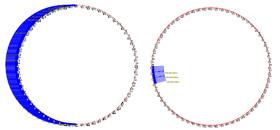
View of surcharge load (asymmetrical) and derailment load on segment
